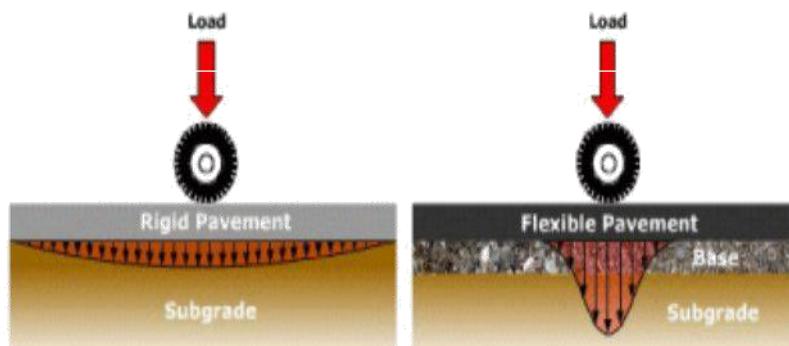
Typical stress distribution under a rigid and a flexible pavement.
